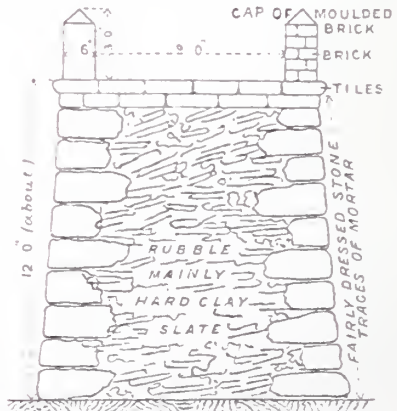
SECTION OF GREAT WALL, WEST OF KUPEI KOW.
